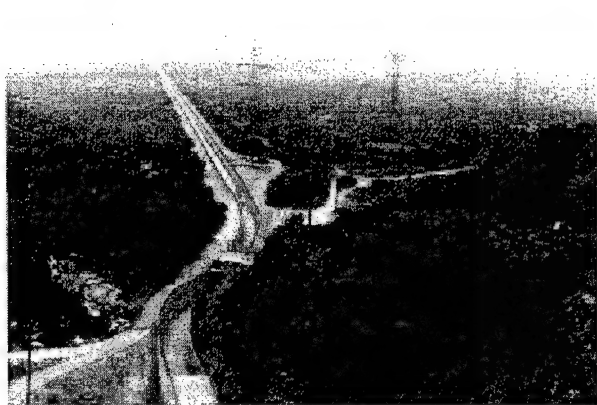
Concrete-lined channel on alluvial fan below debris dam (looking downstream)
